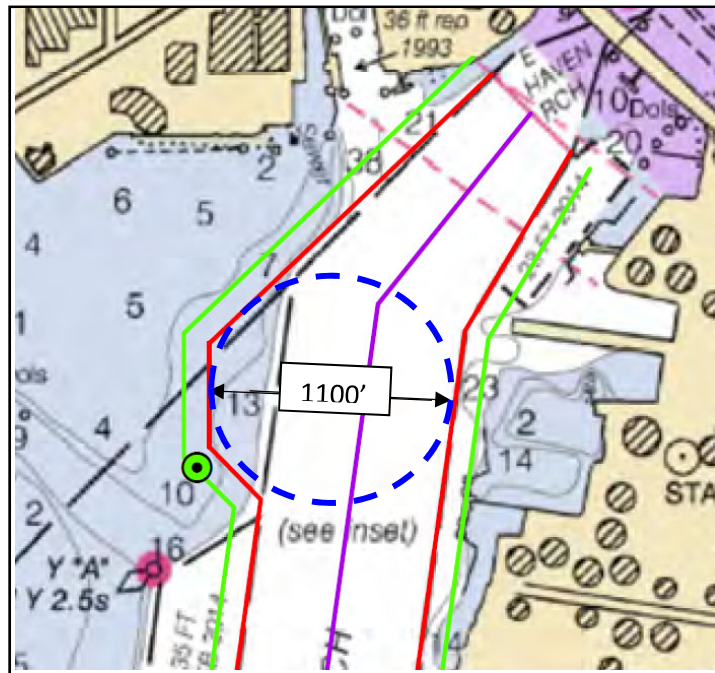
Proposed New Haven Federal Navigation Turning Basin Design
